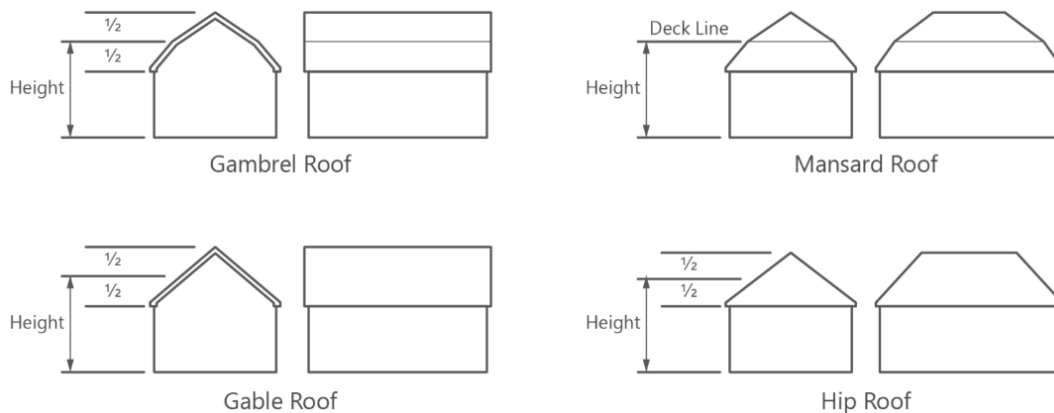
Height Measurement by Roof Type for Principal Buildings
